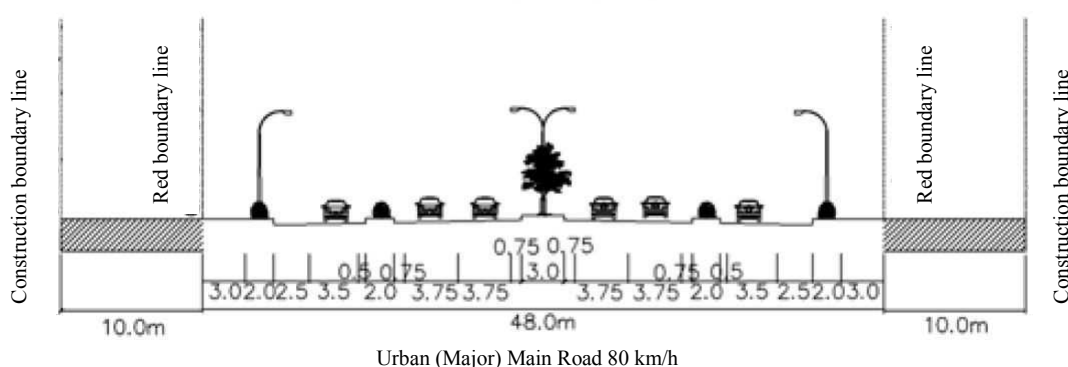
Typical road cross section of Ring Road No. 3 – with collector roads
